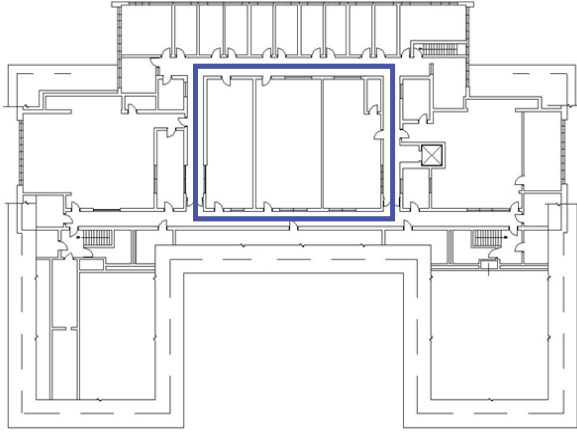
2D floor layout for Atwater Kent building, WPI.
